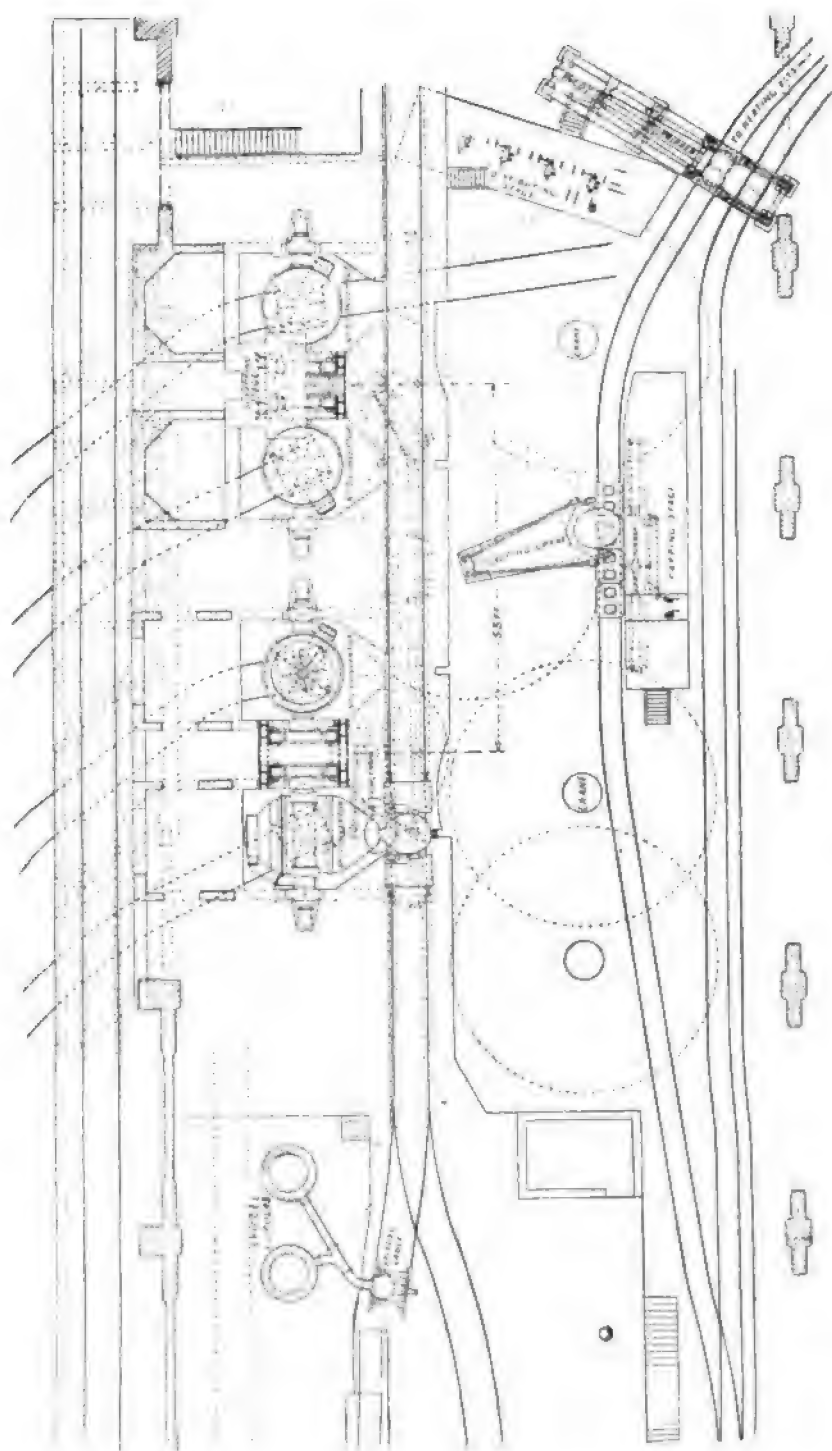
Modern Bessemer Plant. Plan View. (Barrow Hematite Steel Co.'s Works.)
